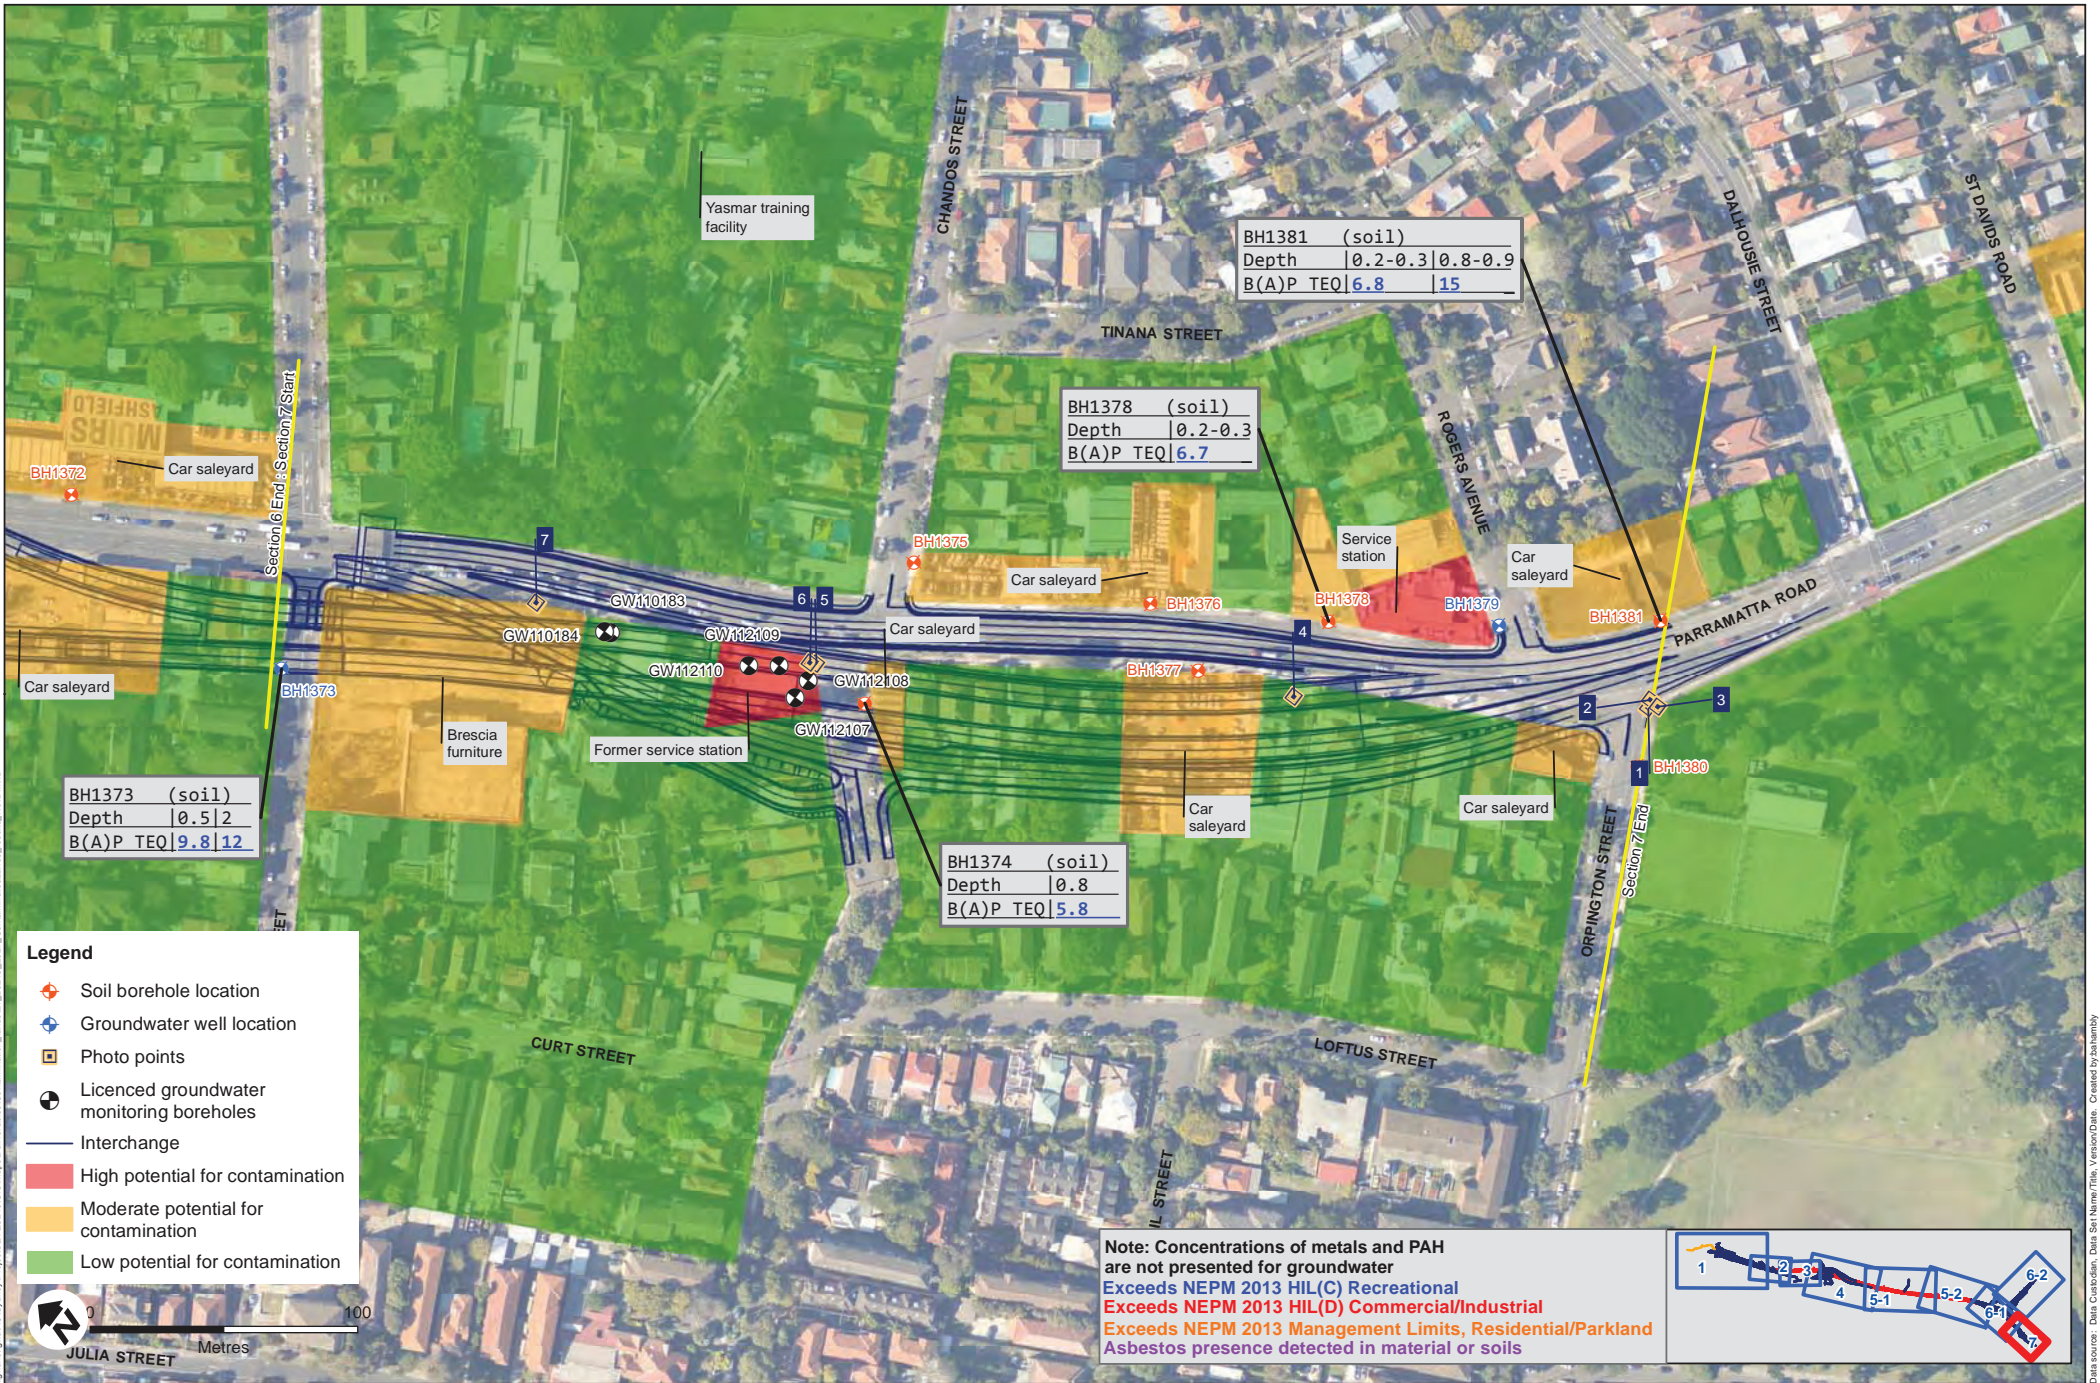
Investigation locations, exceedances, summary of contaminated land survey and land uses Section 7 Bland Street to Orpington Street
